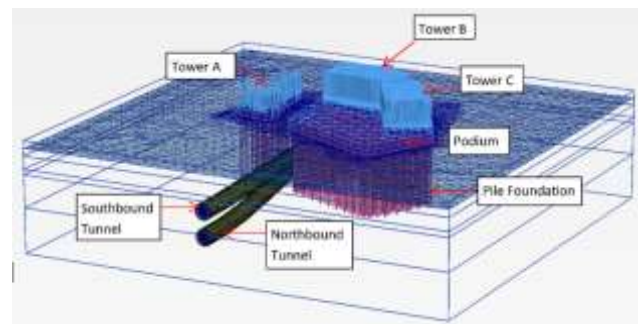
Plaxis 3D model of proposed foundation loading including MRT Tunnels
